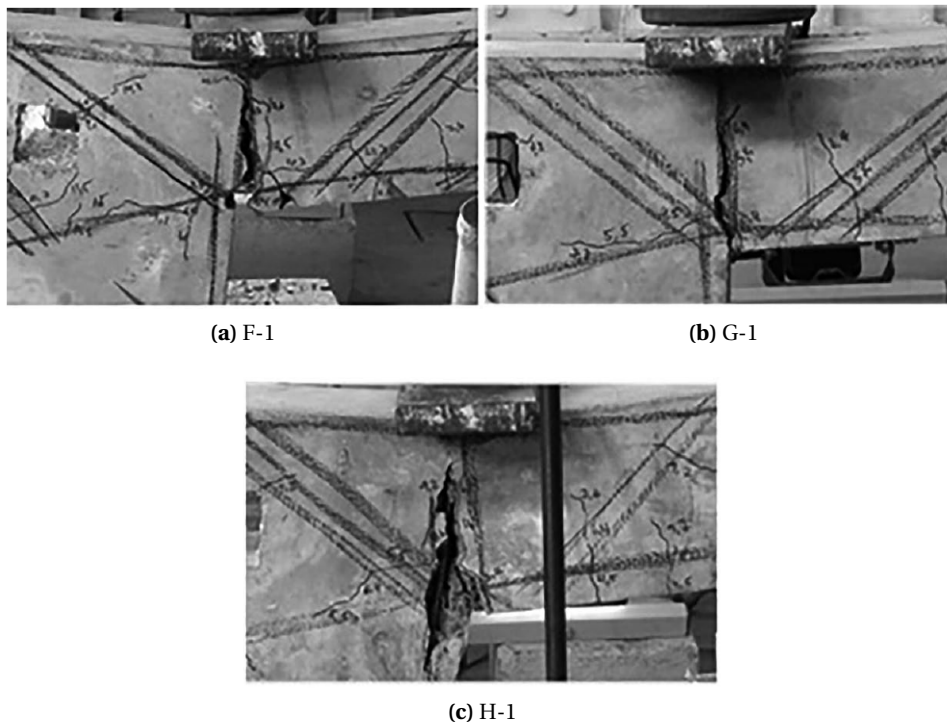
Pictures of specimen series F, G, and H at failure [19].
